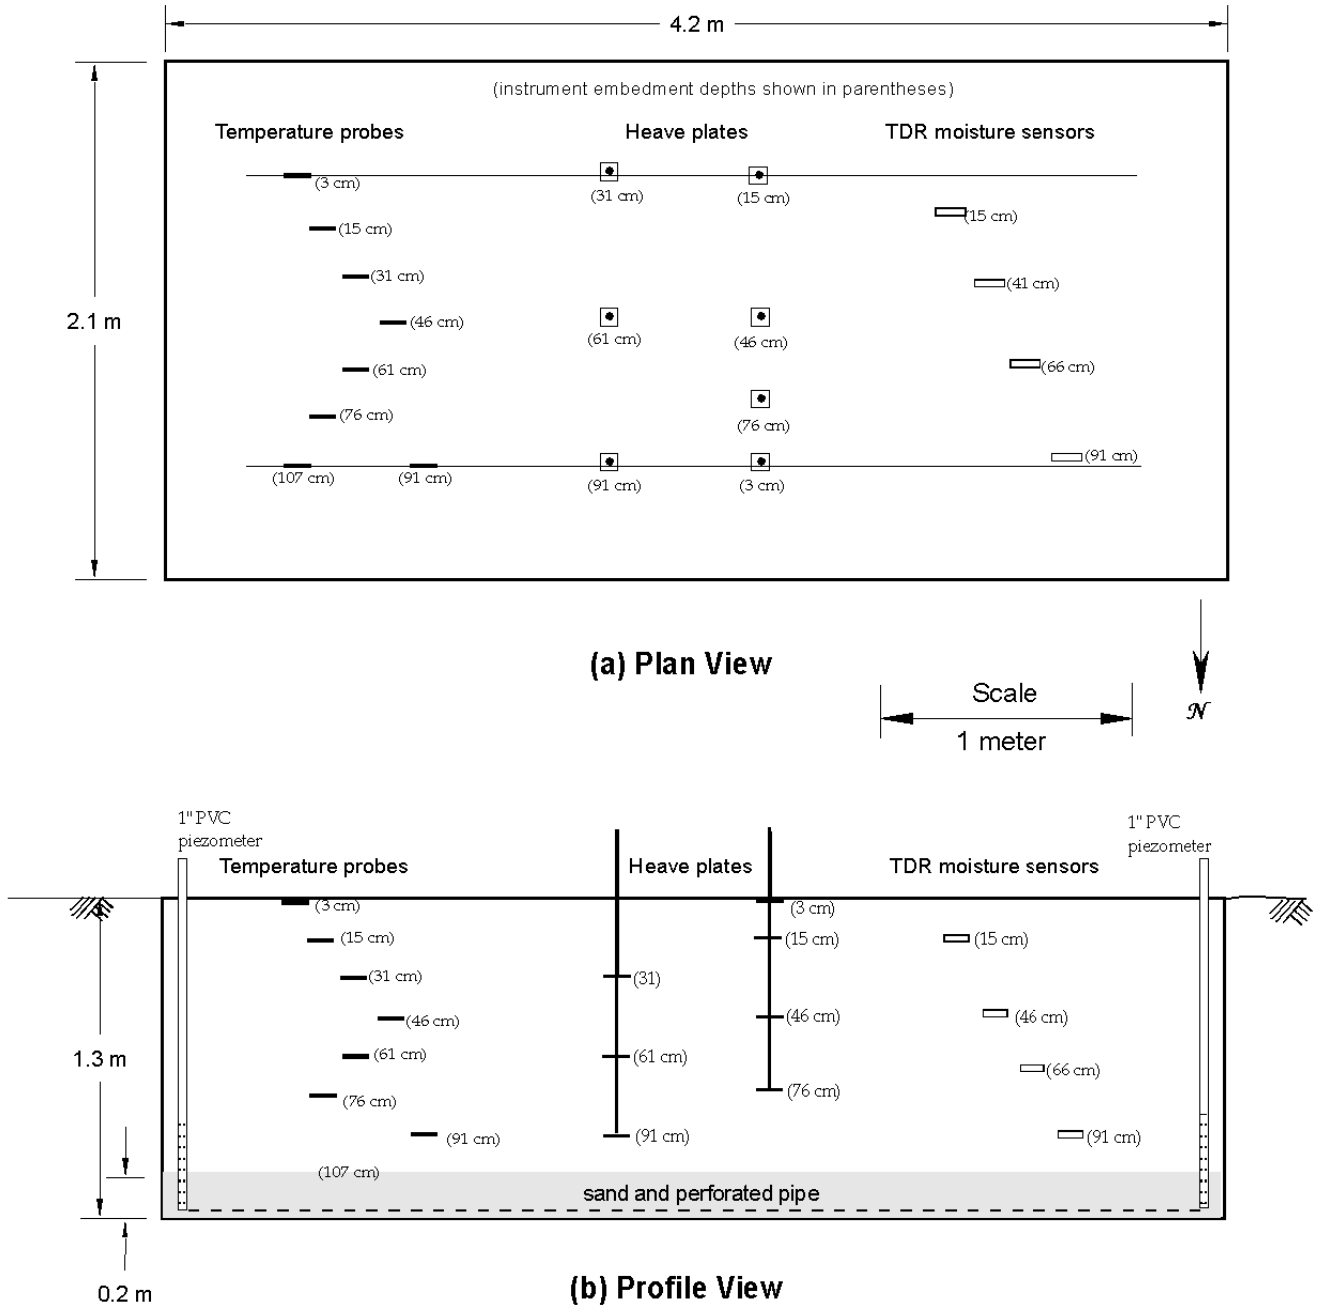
Plan and profile views of the instrumentation and telltale construction at the field frost heave test facility.
